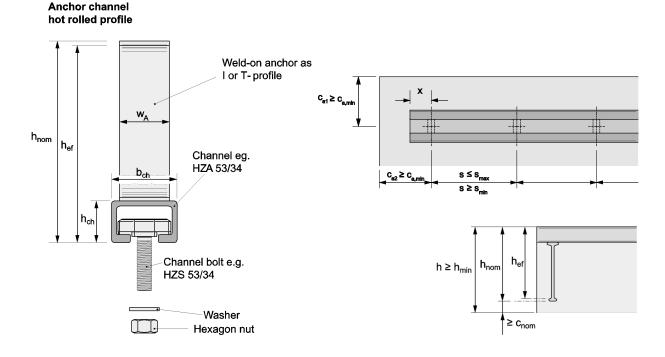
FIGURE A—INSTALLATION PARAMETERS FOR ANCHOR CHANNELS
